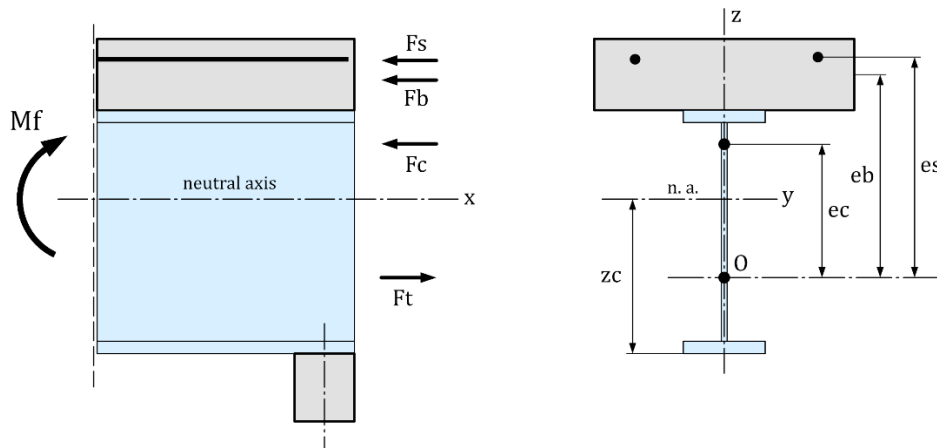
Internal forces in the cross-section of the steel-concrete composite element
